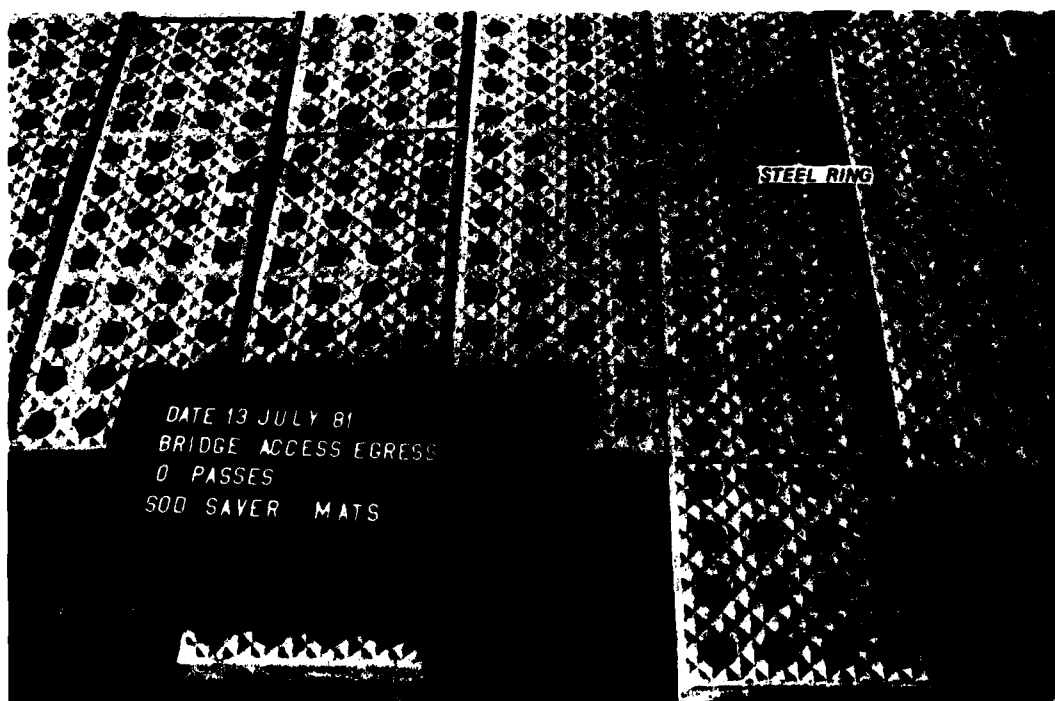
Close-up of Sod Saver Blocks on test section before traffic, showing staggered pattern and location of steel rings, test II
